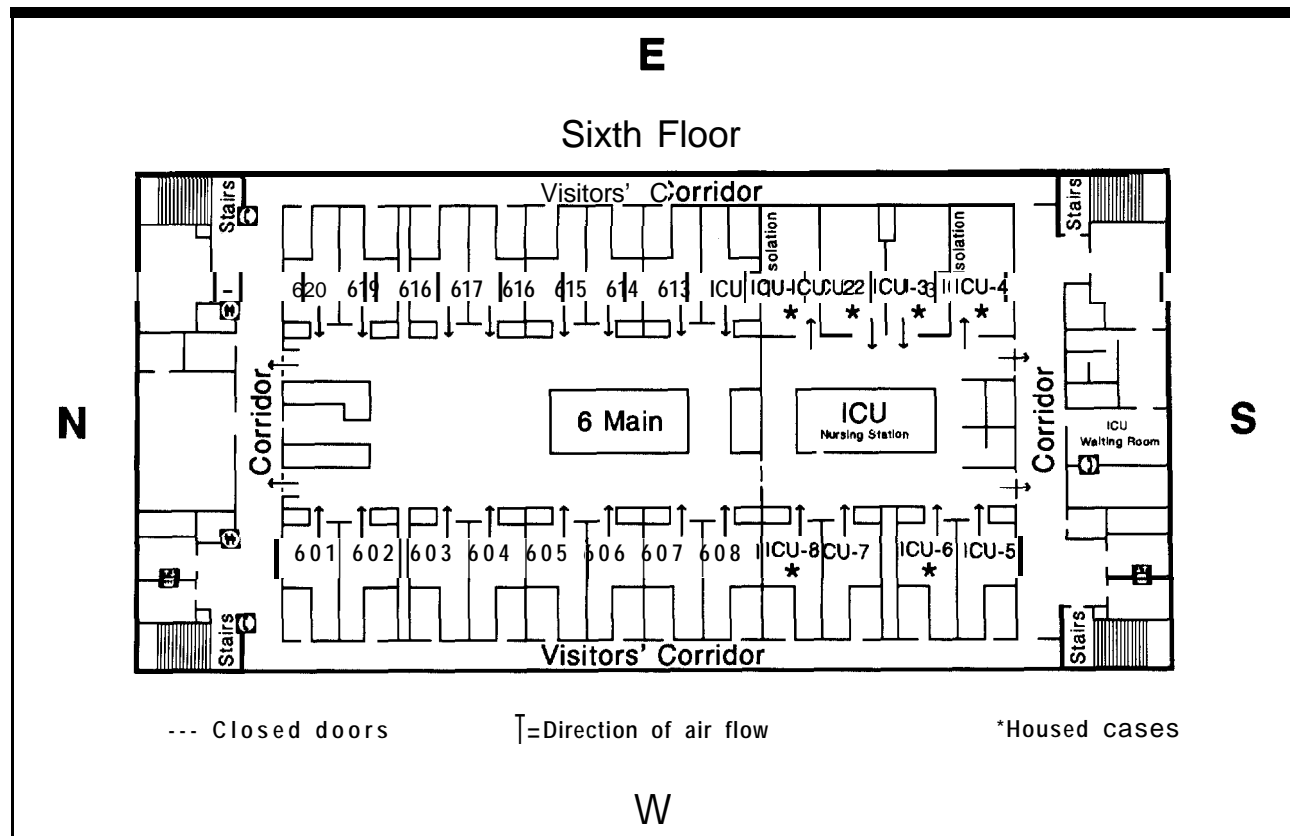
FIGURE. Floorplan of the sixth floor. Arrows denote pressure gradients.
